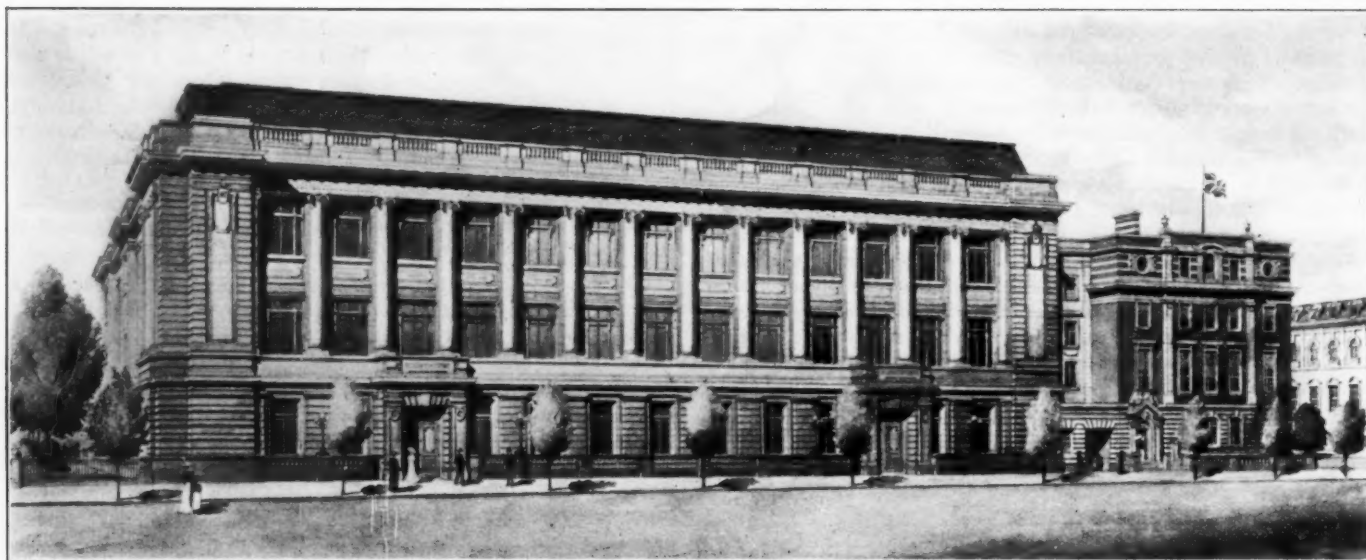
ARCHITECT'S DRAWING OF FRONTAGE OF MUSEUM BUILDING ON EXHIBITION ROAD—NOW UNDER CONSTRUCTION
